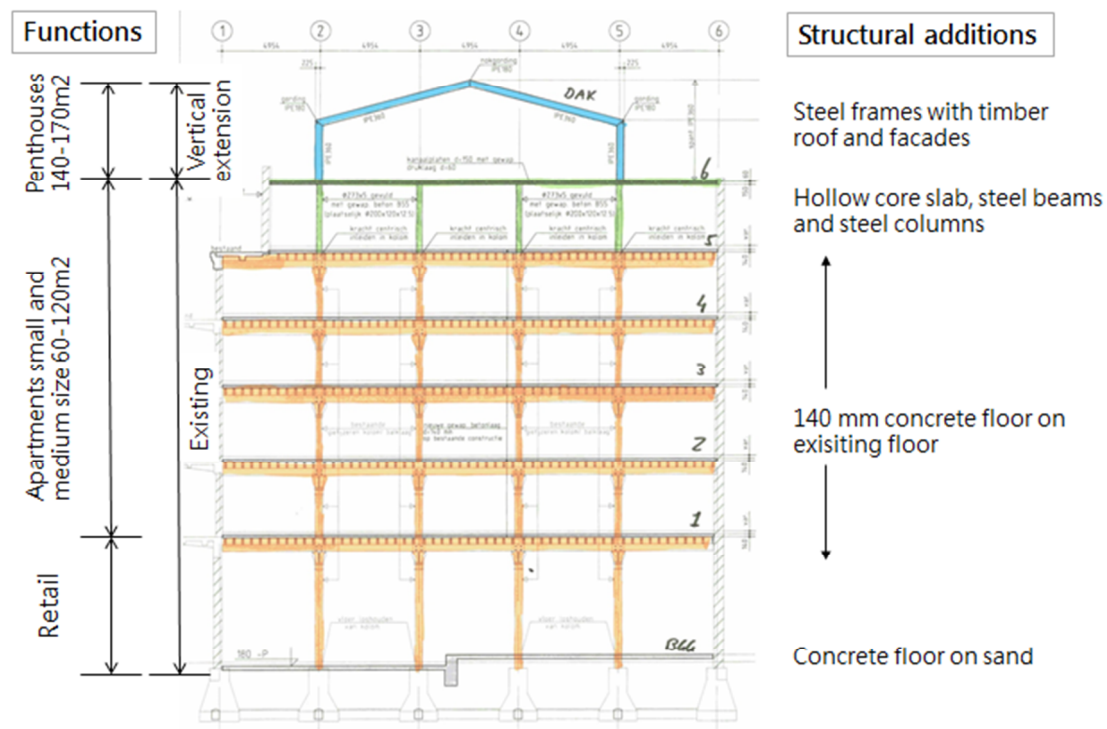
Jobsveem - Schematic representation of the new functions, both old and new parts of the building and the adequate structural provisions used to improve the building's performance
